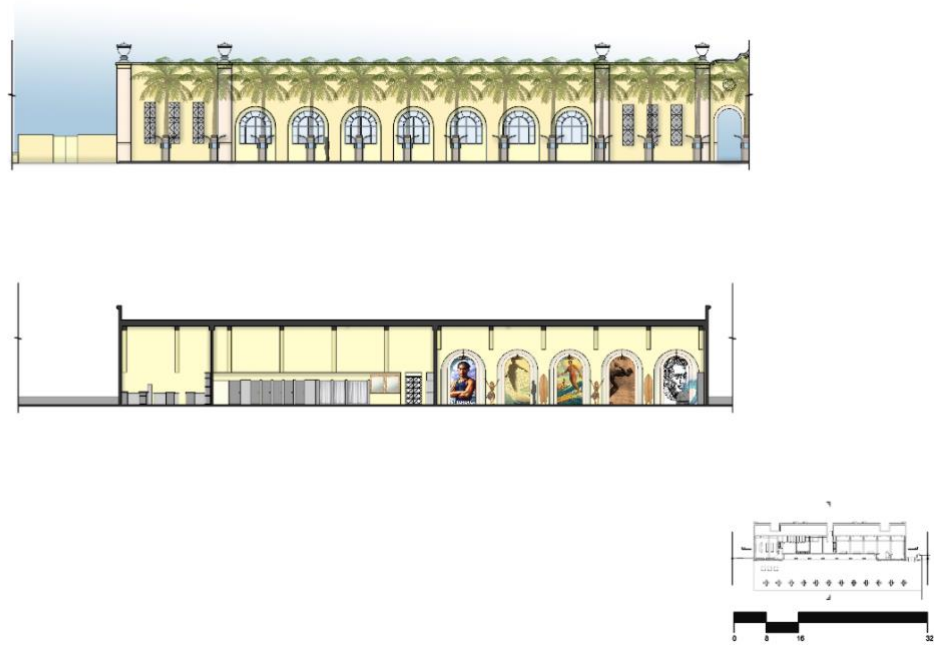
New Elevation + Longitudinal Section – Diamond Head Side
